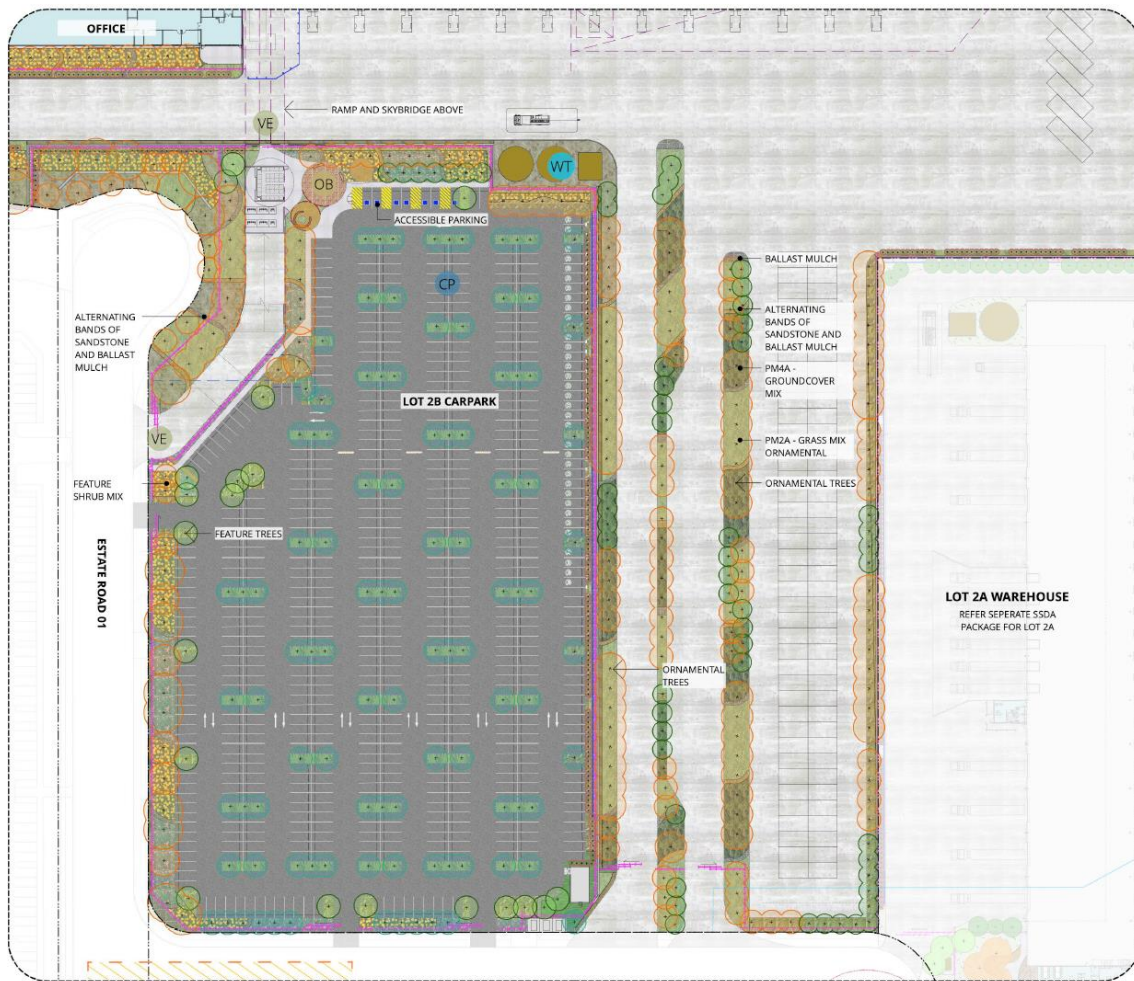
Landscape detail plan showing Lot 2B car parking area (Source: Scape)
